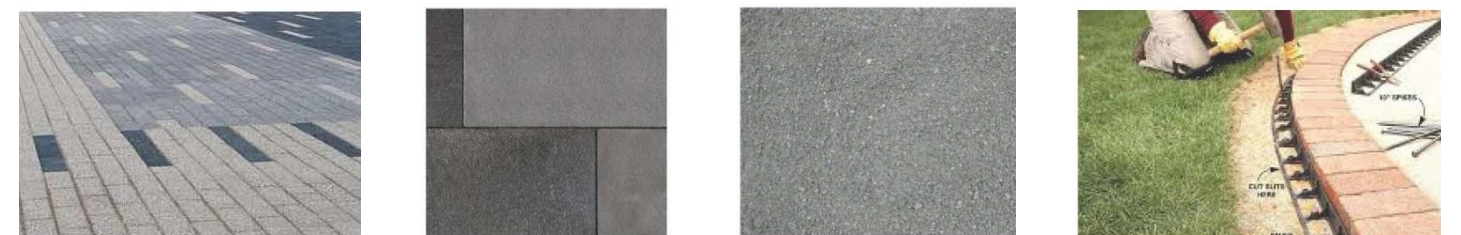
Examples of unit pavers, unit paver detail, stone dust surface and construction of stone dust path with edge trim of unit pavers.
